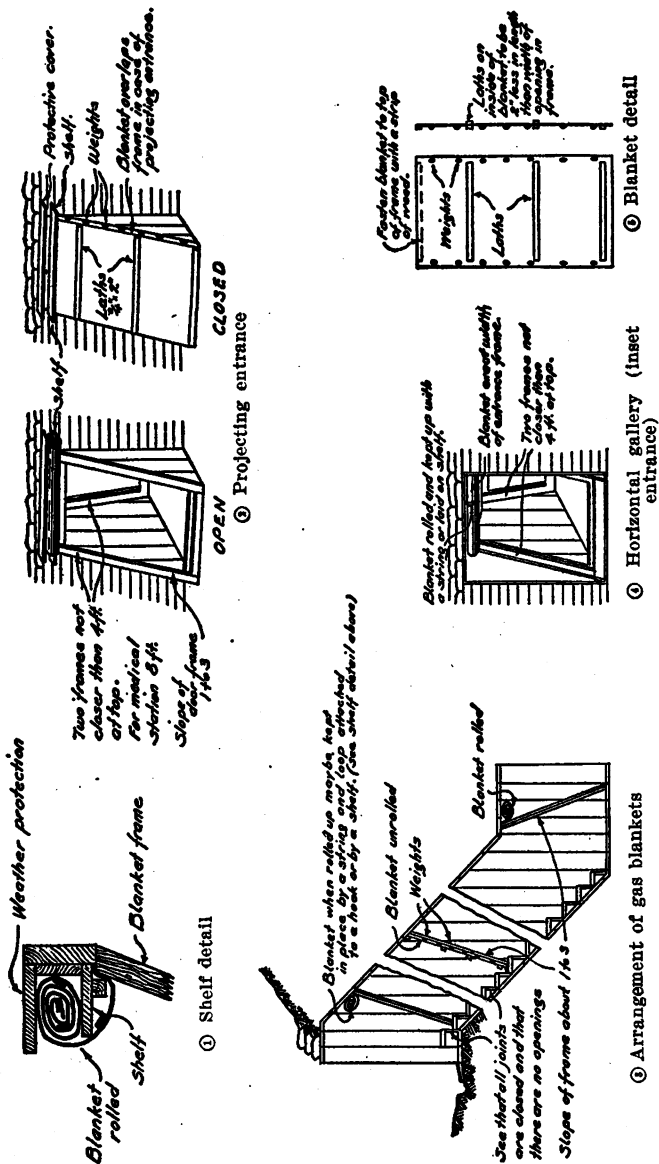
Typical arrangement for gas-proofing dugouts
